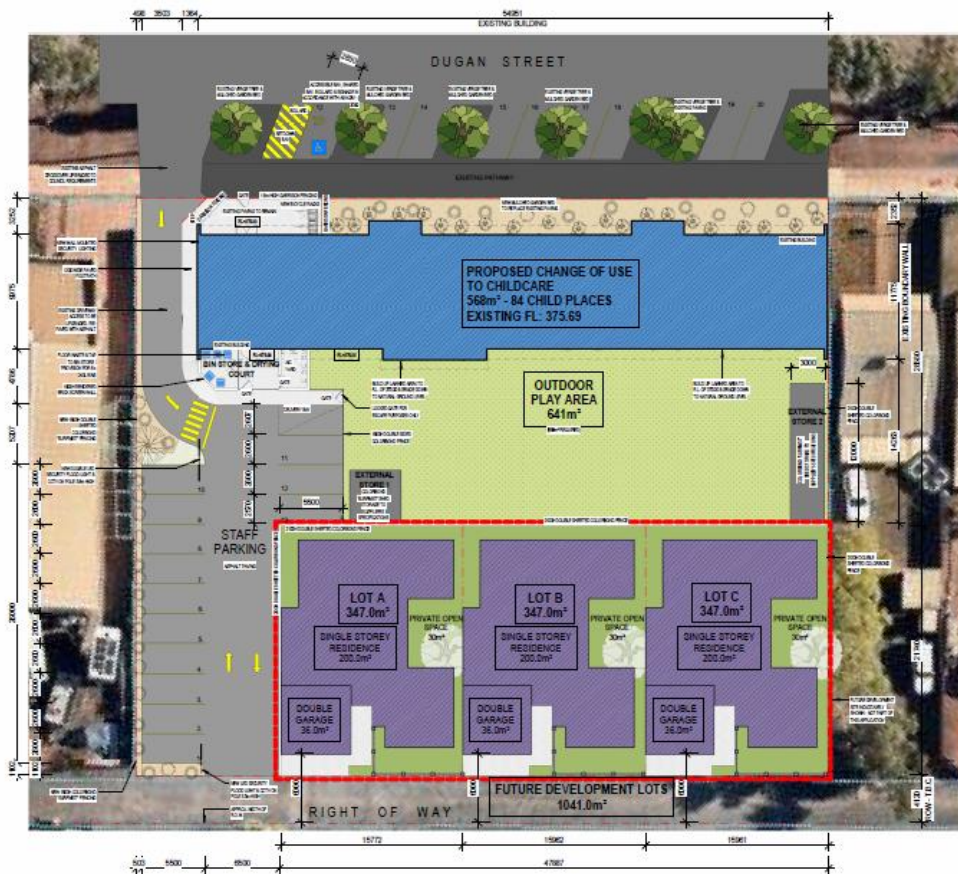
Proposed Site Plan of No. 67-71 (Lot13) Dugan Street, Kalgoorlie
